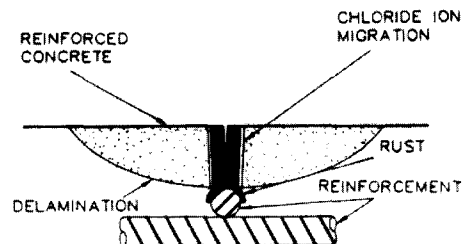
Reinforced corrosion spalling mechanism
